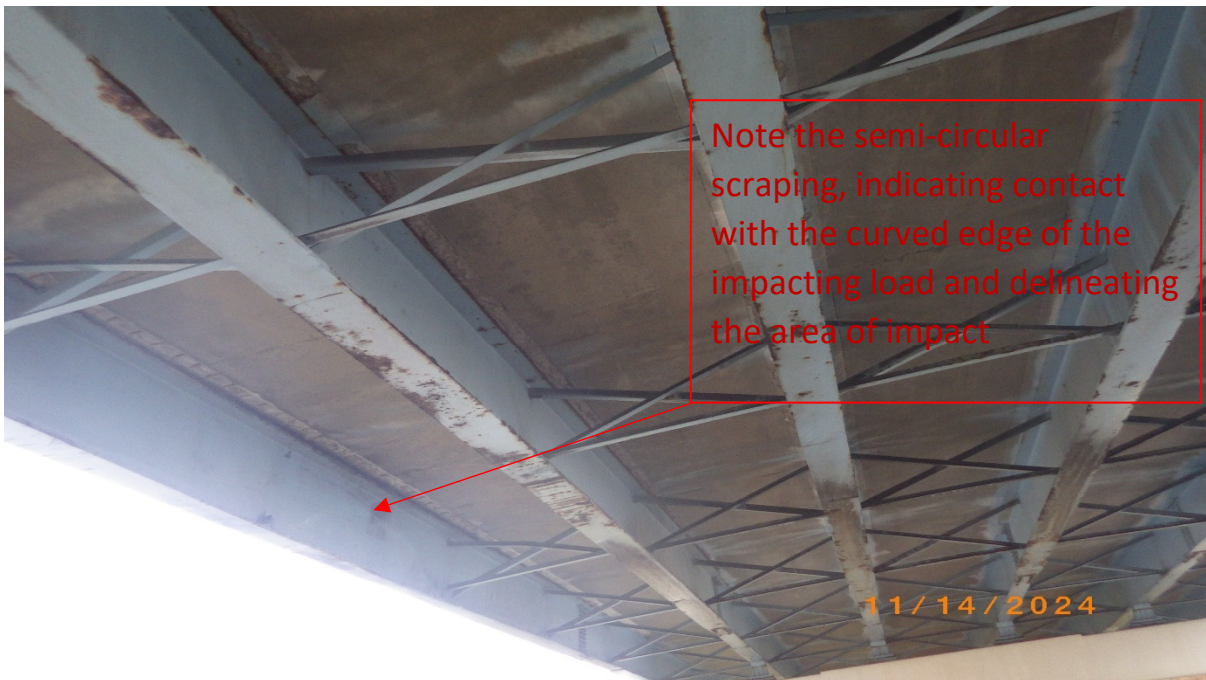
Span 3 Beams 1 and 2, looking south, immediately following impact
